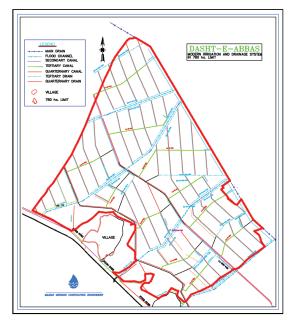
Layout of modern on-farm irrigation and drainage system in 780 ha (sample unit)
